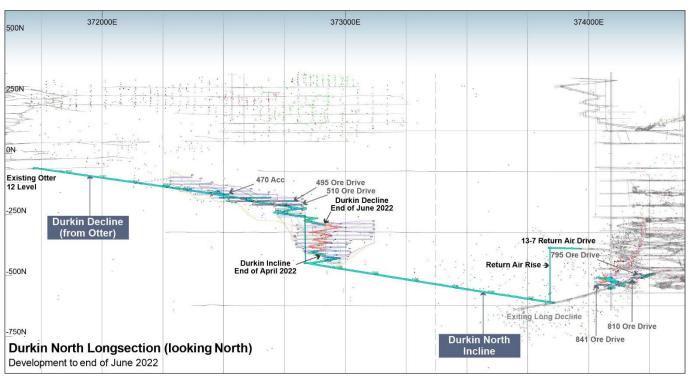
Durkin North Mine Plan Design (Long Section Looking North). Development as at 30 June 2022
